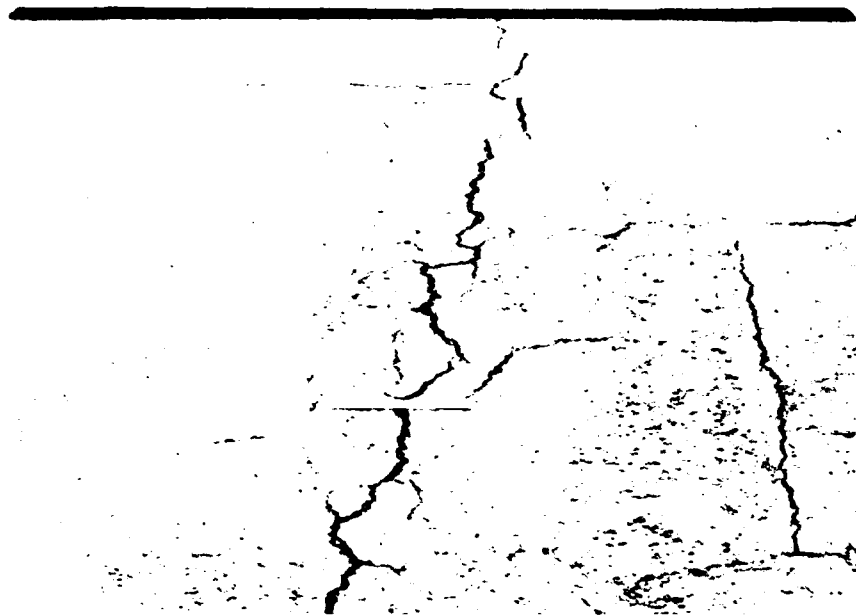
Medium-severity longitudinal and transverse cracking [$3/4$ in. (19 mm) crack surrounded by light random cracks].
